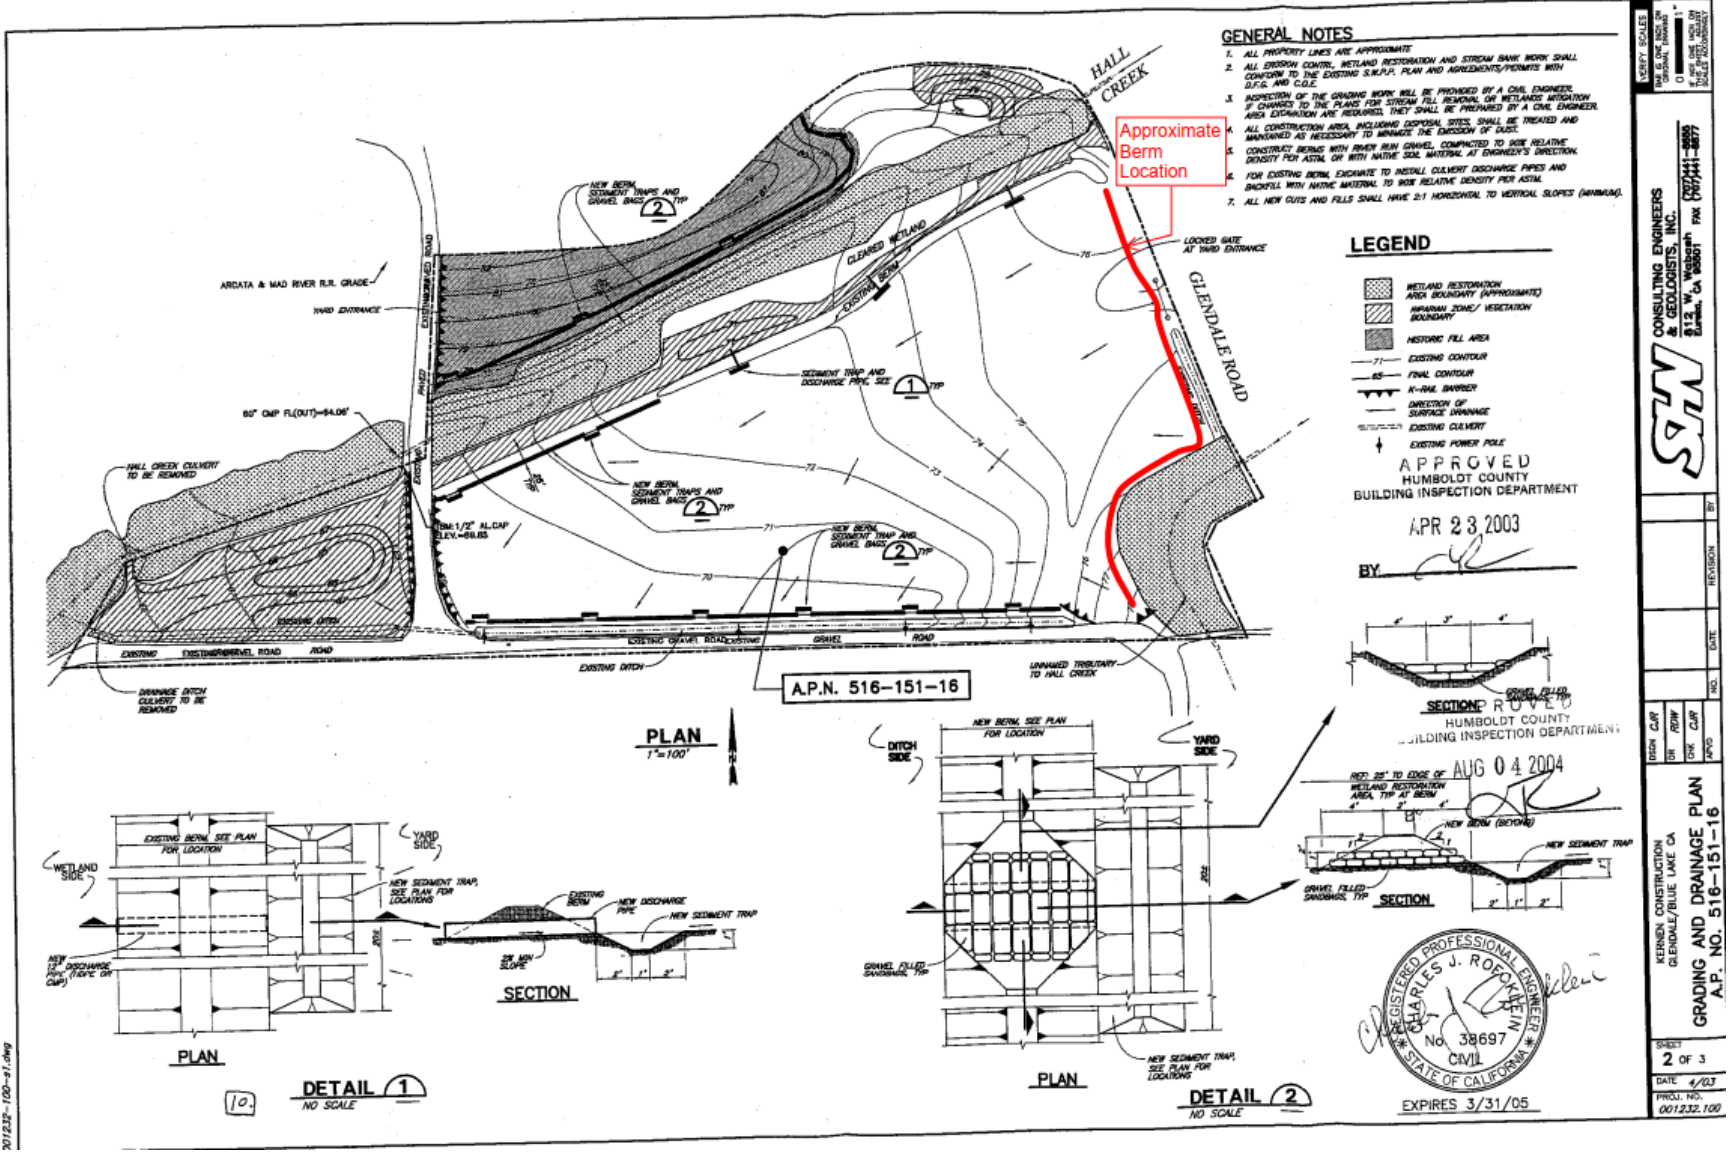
Site Plan Authorized by CUP-00-27/SP-00-65
